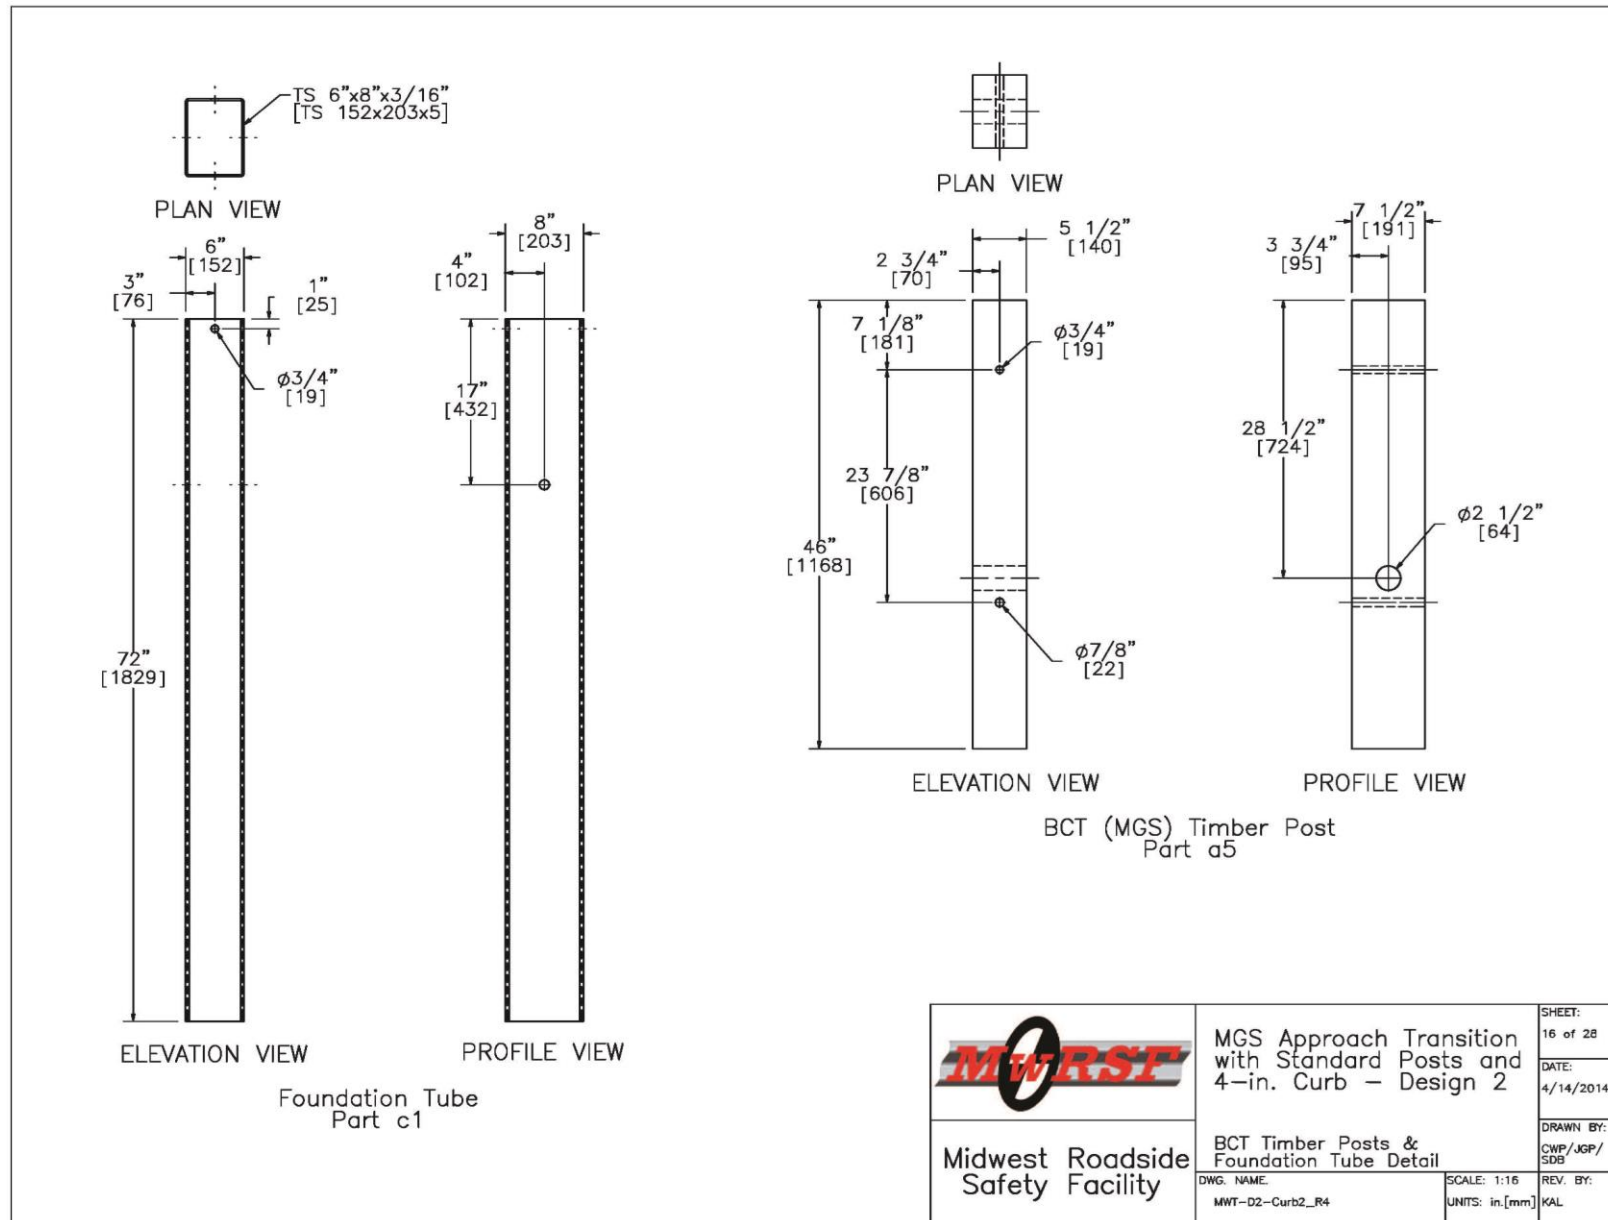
BCT Timber Posts and Foundation Tube Detail, Test Nos. MWTC-2 and MWTC-3
